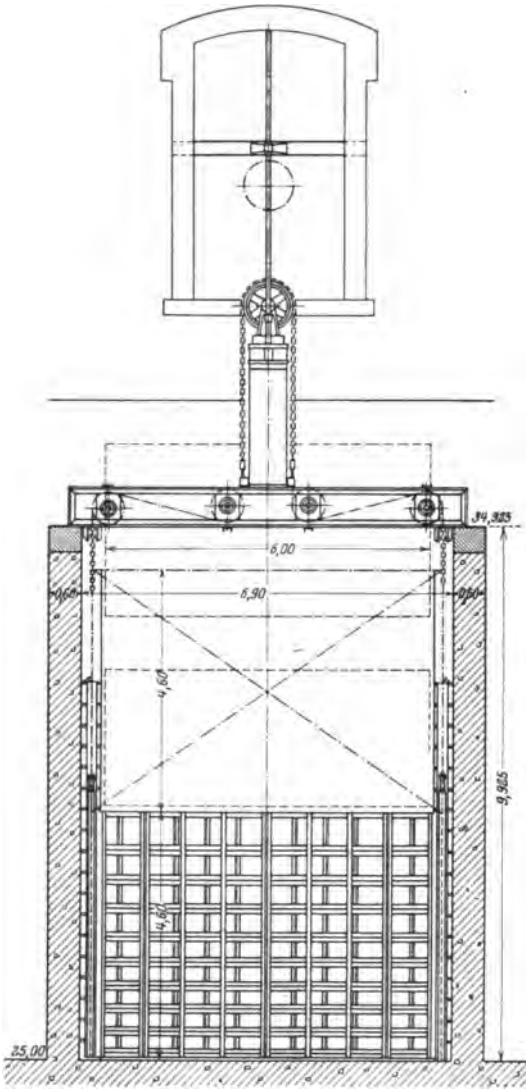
Elevation of Intake Gate. Tuilière Plant.
